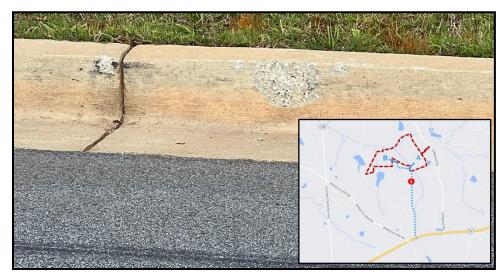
Palmetto Logistics Parkway Minor Curb Cracking
